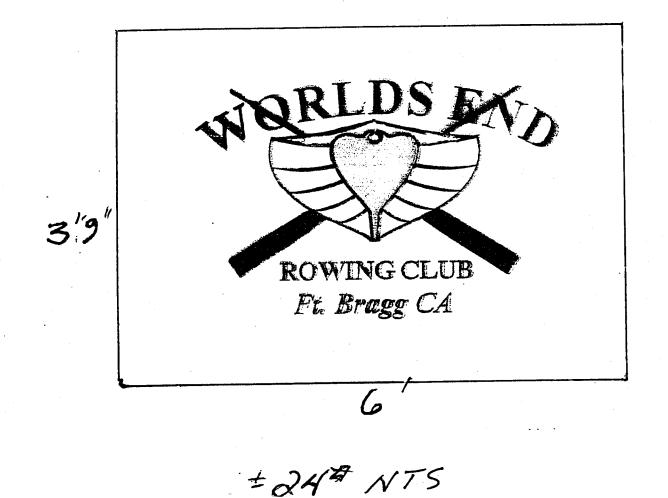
APPLICATION NO. 1-04-033 (Dillion) Project Site Plan (Page <u>1</u> of <u>4</u>)
